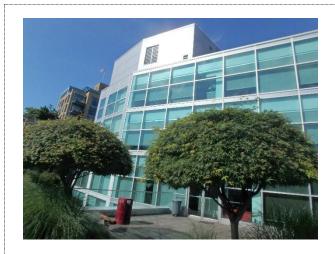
General view of the curtain wall as seen from the east side 3rd floor terrace.
